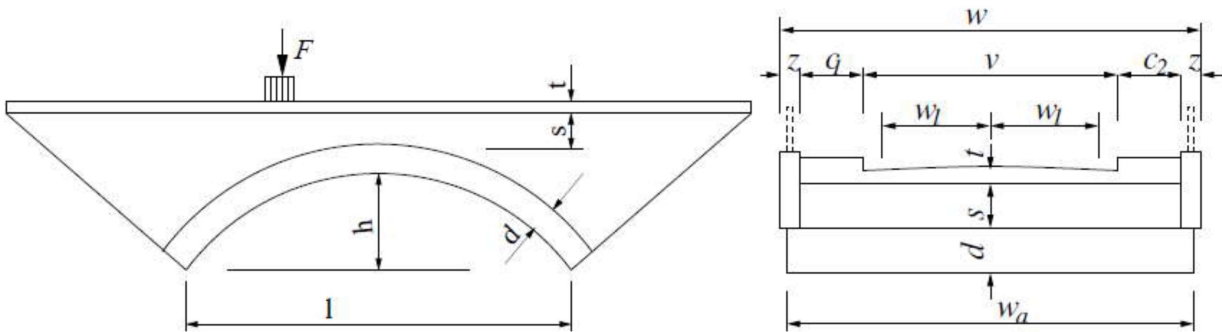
Longitudinal and transverse bridge sections (MD ČR, 2008)
